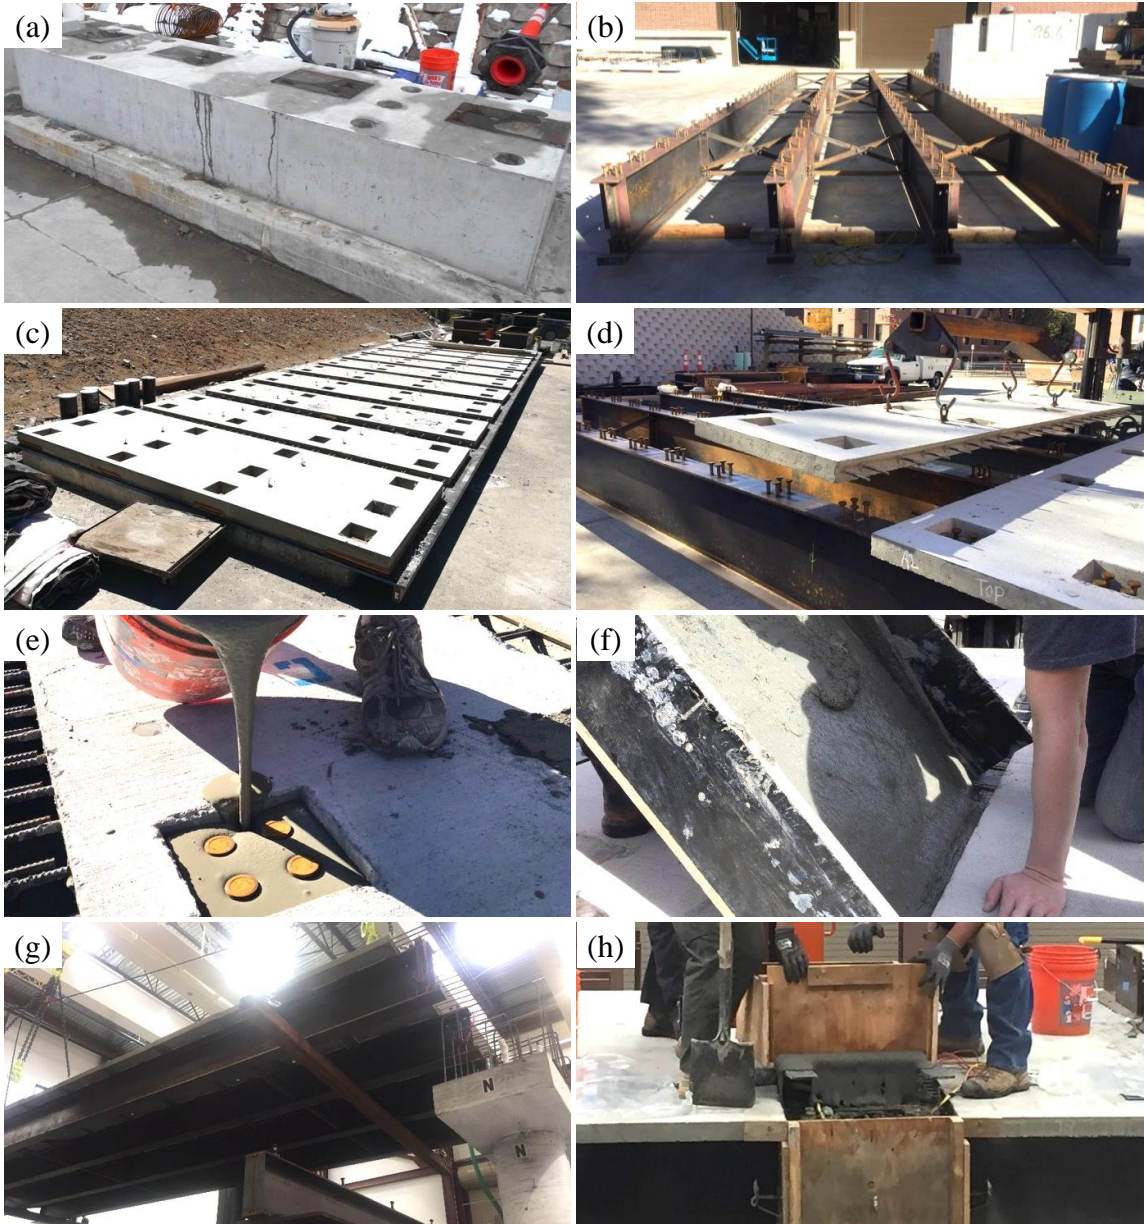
(a) Abutment seat, (b) Steel girders, (c) Deck panels, (d) Placement of deck panels over the girders, (e) Grouting deck pockets, (f) Casting UHPC in the joints, (g) Placement of east span over the abutment seat and precast cap beam, (h) Casting UHPC in the top layer of cap beam (Images by Elmira Shoushtari)
